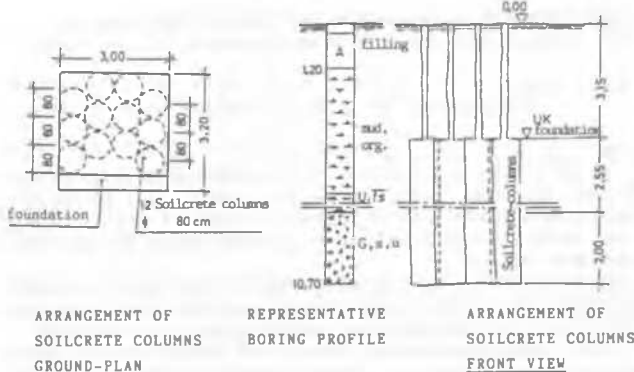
Arrangement of the Soilcrete-columns supporting a foundation block
